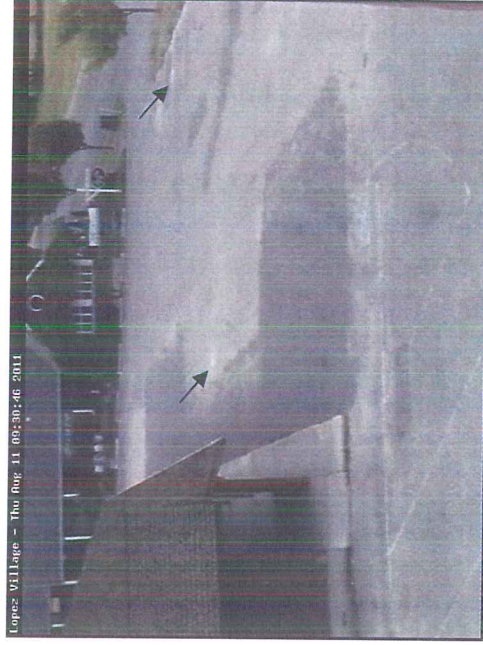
A view to the northeast from the southwest corner of the subject property looking at the location of Test Pit #10.
